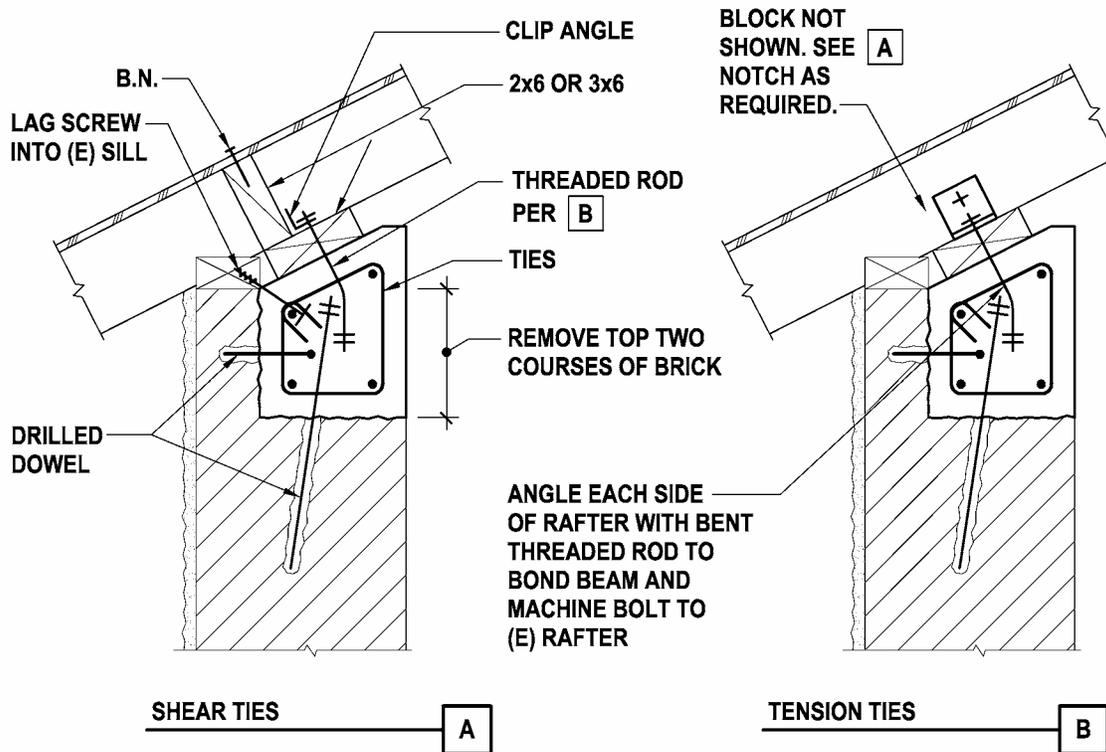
Bond Beam at a Sloping Roof with Limited Clearance
